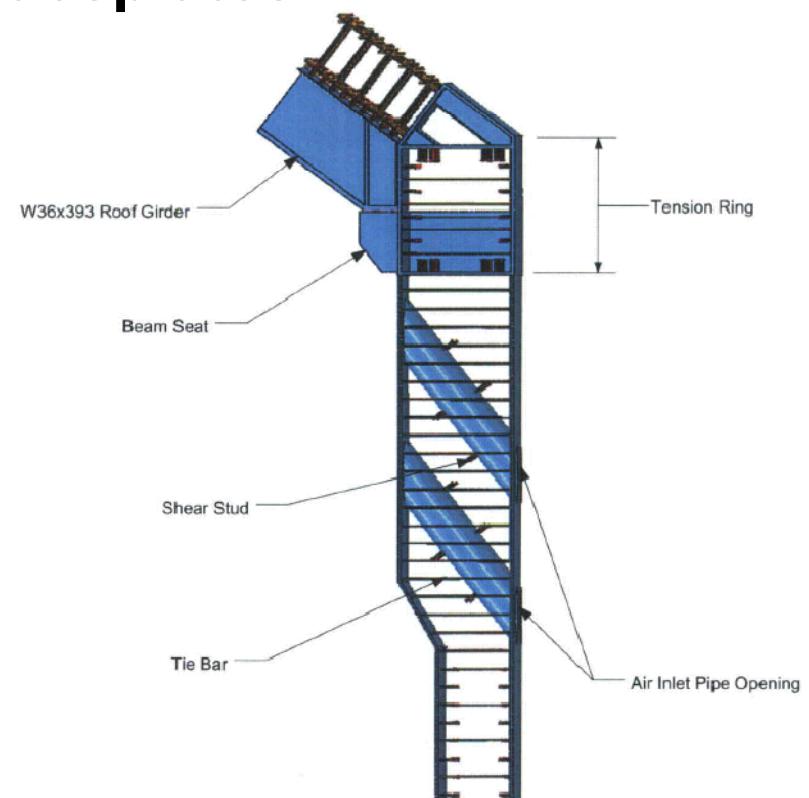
Elevation View of Tension Ring and Air Inlets
